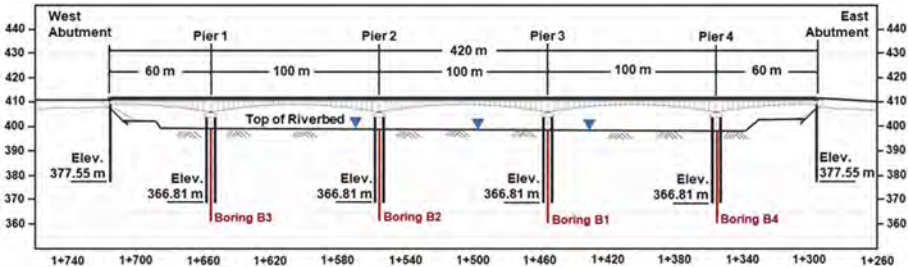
Elevation profile of the bridge super- and substructure and approximate boring locations.
